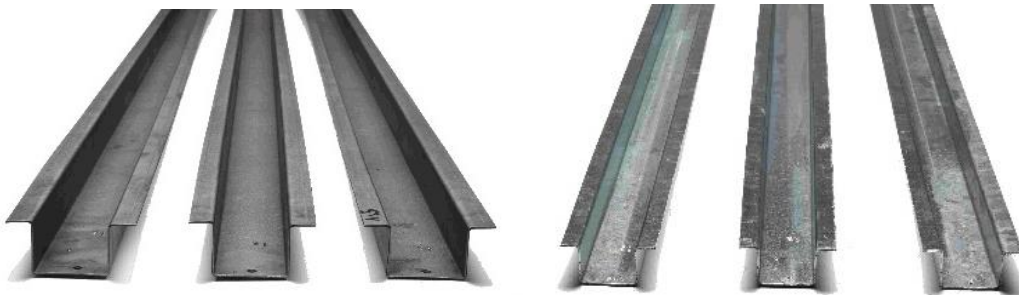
Excerpt of photo documentation: hat-supporting profile, test series 1; t= 1.50 mm; Steel 235 before galvanizing (left) after galvanizing (right).
